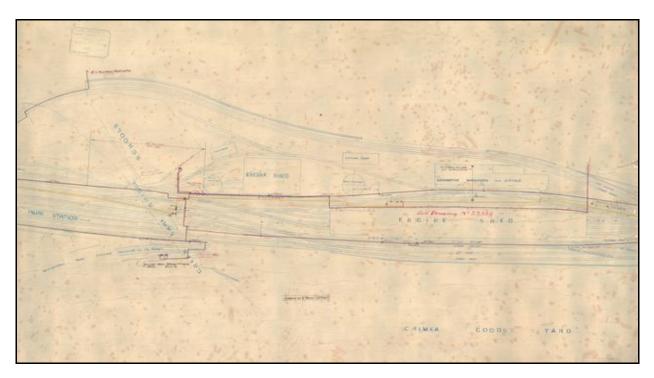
1899 Westbourne Park GWR Survey Plan Sheet 5 (© Wiltshire and Swindon Heritage Centre GWR Drawing No. 2515-410-1331)
